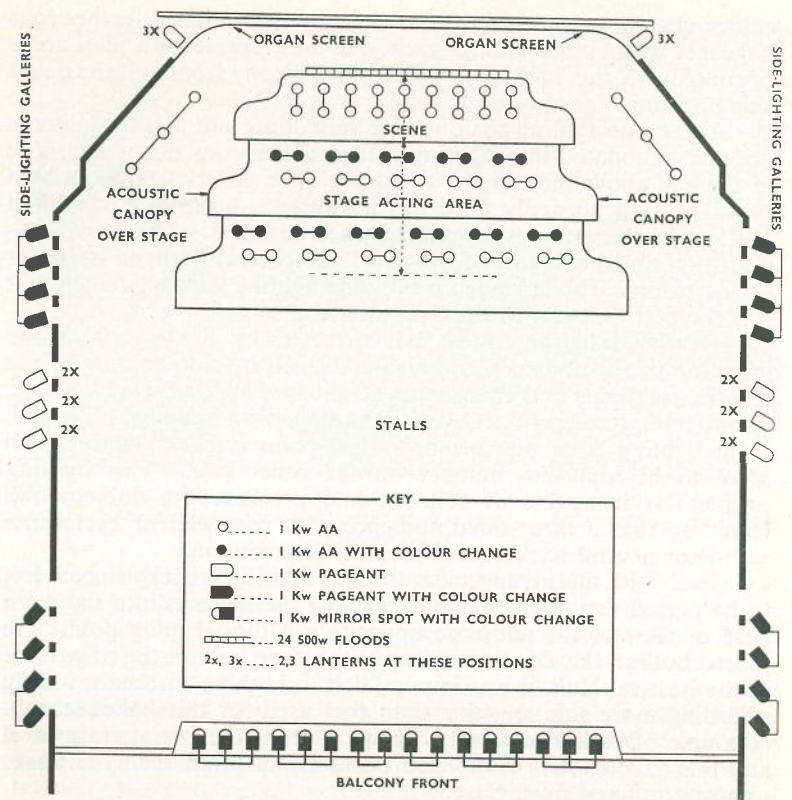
Plan of the layout of lighting equipment for the stage of the Royal Festival Hall.
